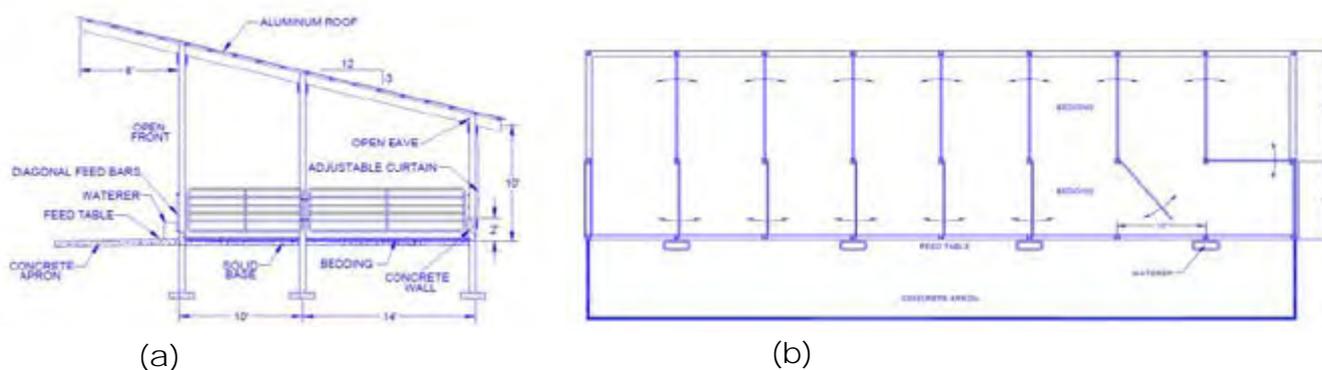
Housing for transition heifers (a) cross section for an open shelter with bedded pack and (b) a floor plan of group housing using gates for division
